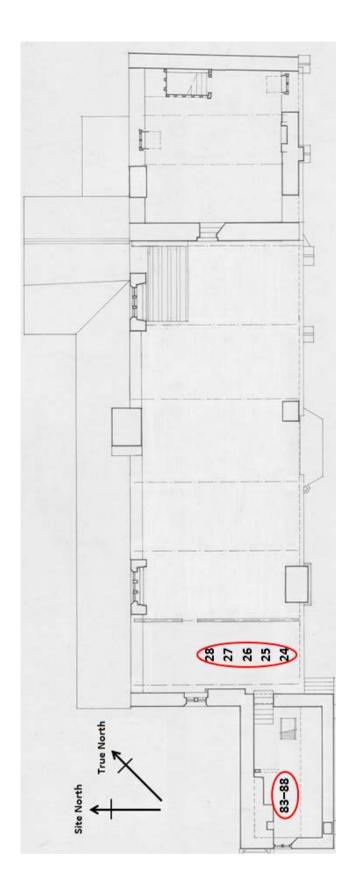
Plan at attic-floor level to locate sampled ceiling timbers (after HBMC 1986)
